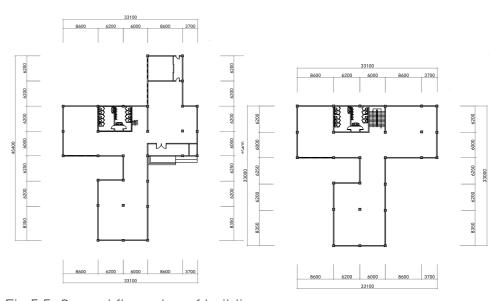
Ground floor plan of building Fig 5.6. First floor plan of building
